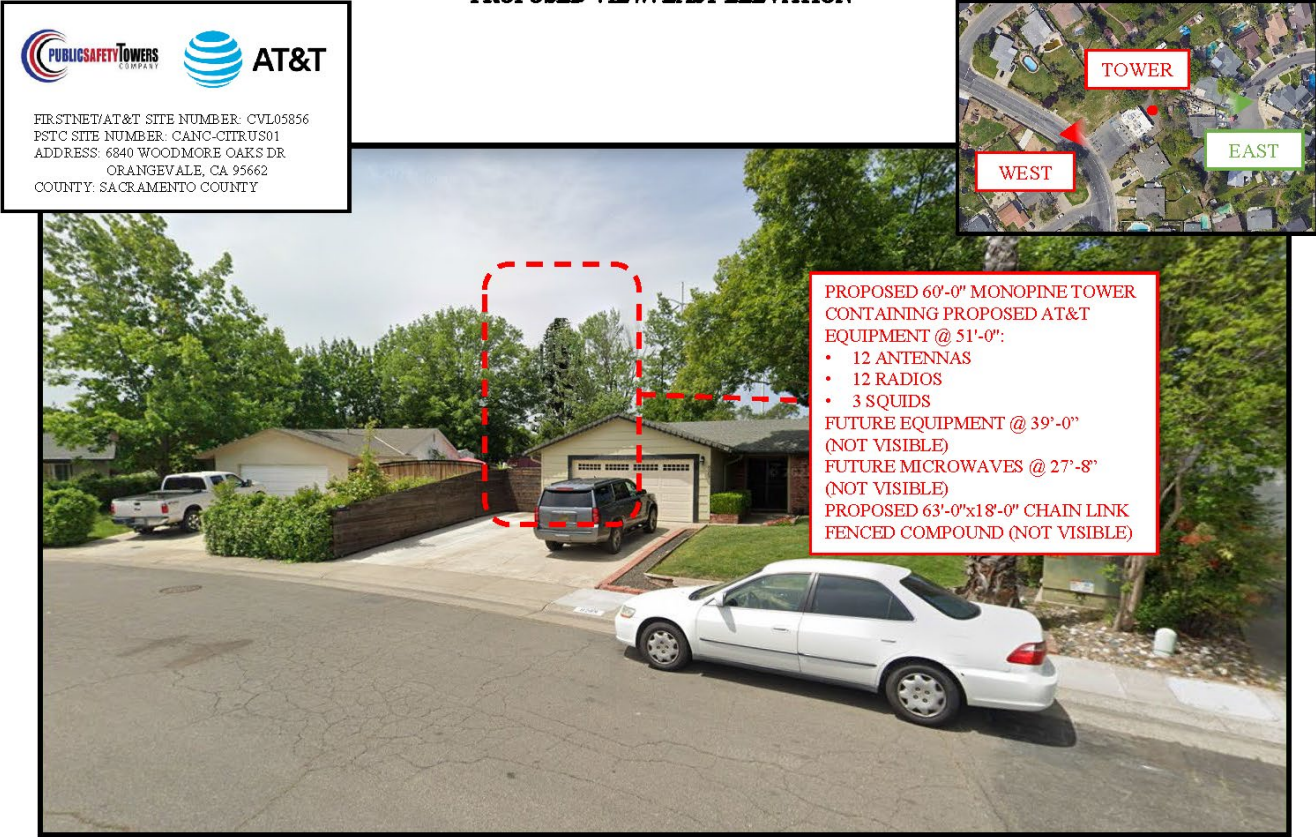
PHOTO RENDERED BY TOWER ENGINEERING PROFESSIONALS, INC.
